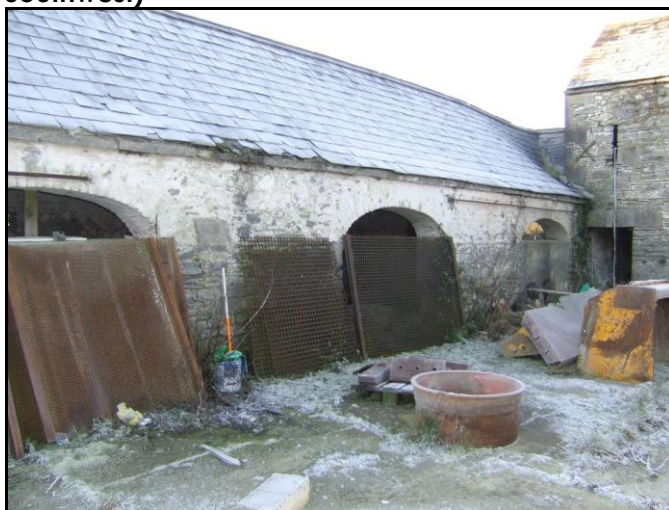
BH6, Northern Elevation of Outbuilding 3 showing Arches (Looking West – Southwest)
